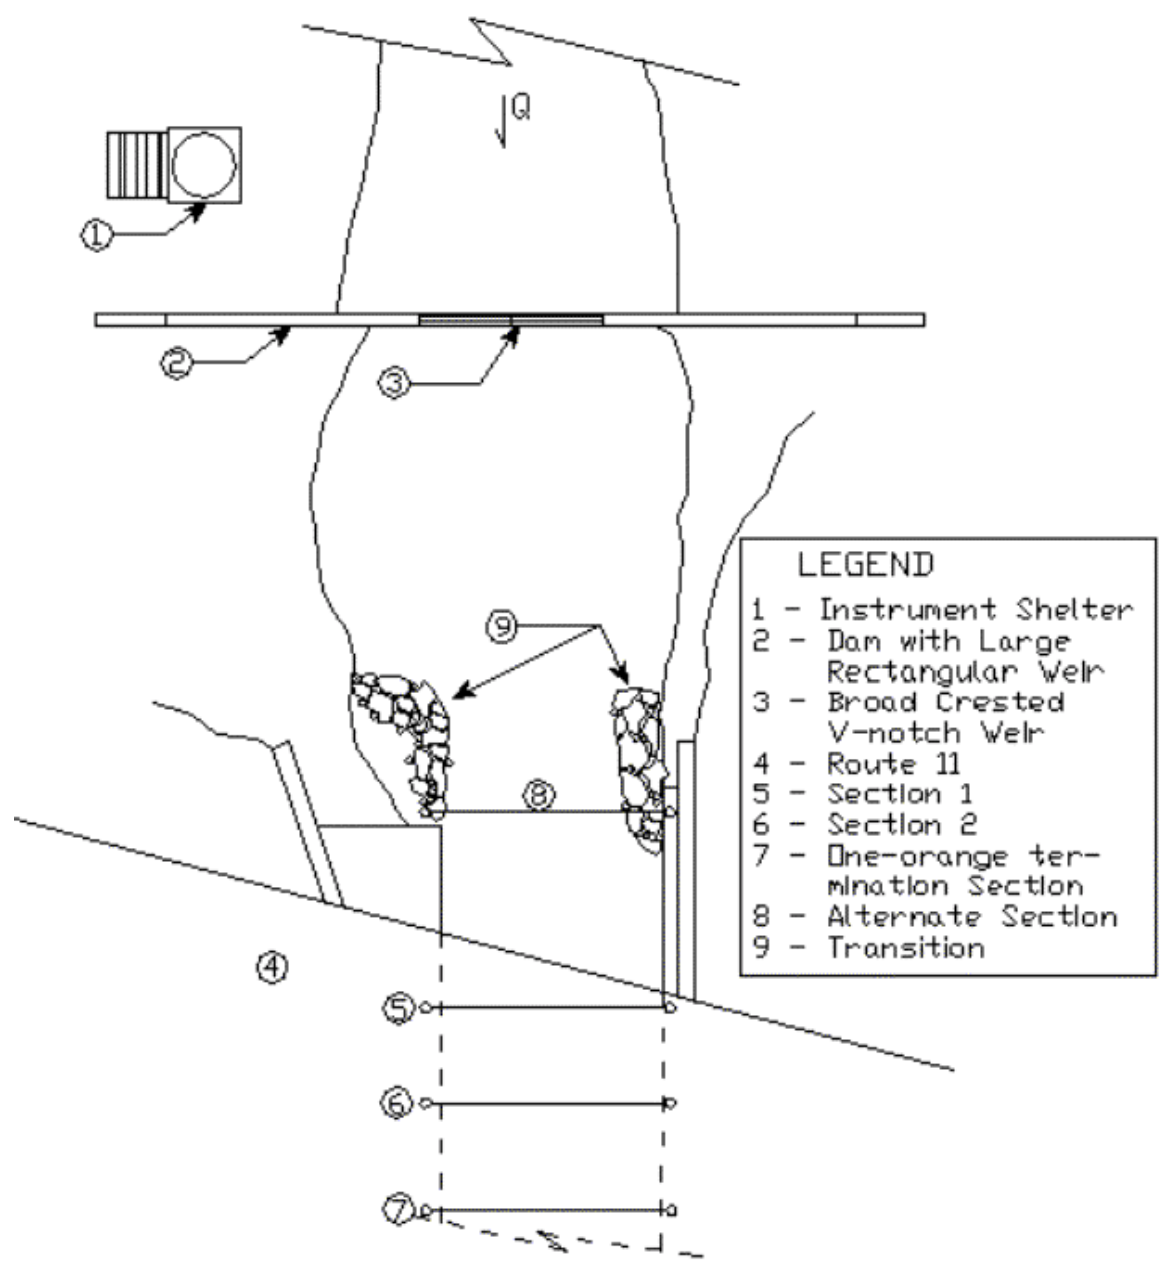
Plan View of the Thorne Springs Branch gaging station (not to scale).
